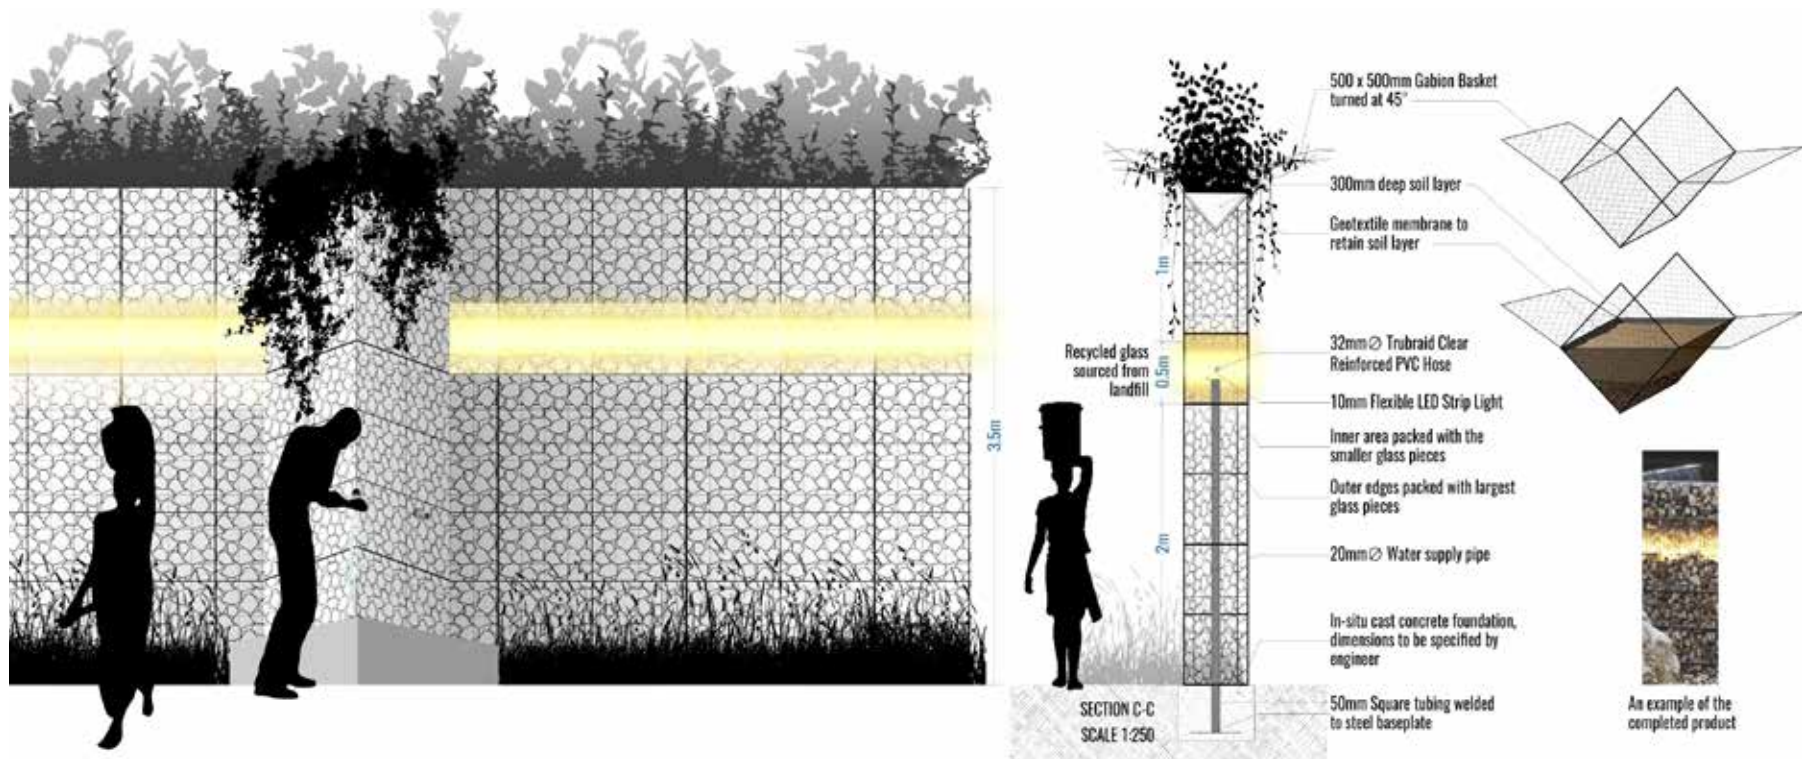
Elevation and section C-C through gabion at open air outdoor shower facility
